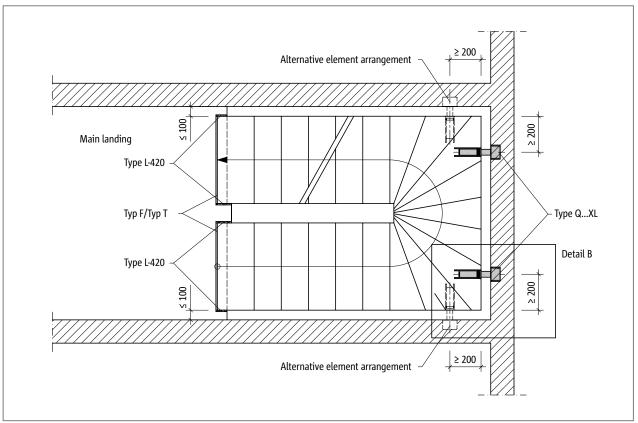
Schöck Tronsole® type Q...-XL: Component arrangement in the layout with a joint width of maximum 100 mm
